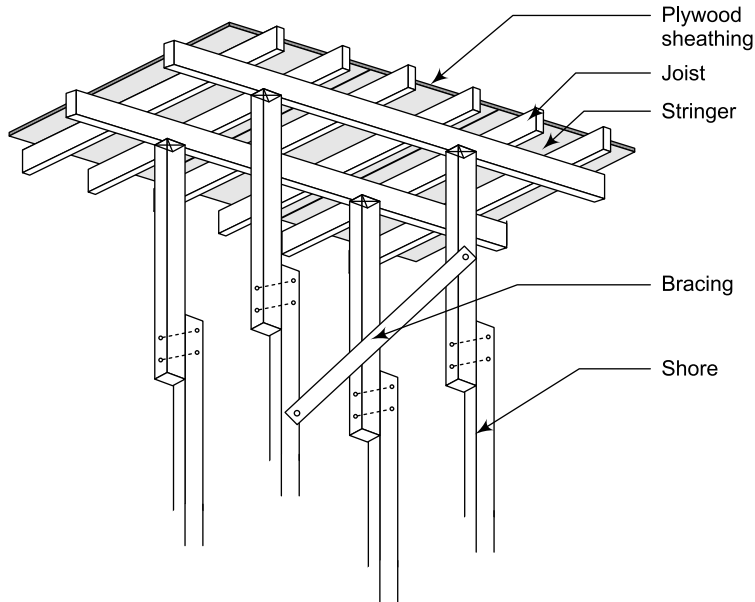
Timber Shore Arrangement (Note the Bracing of Shores).
